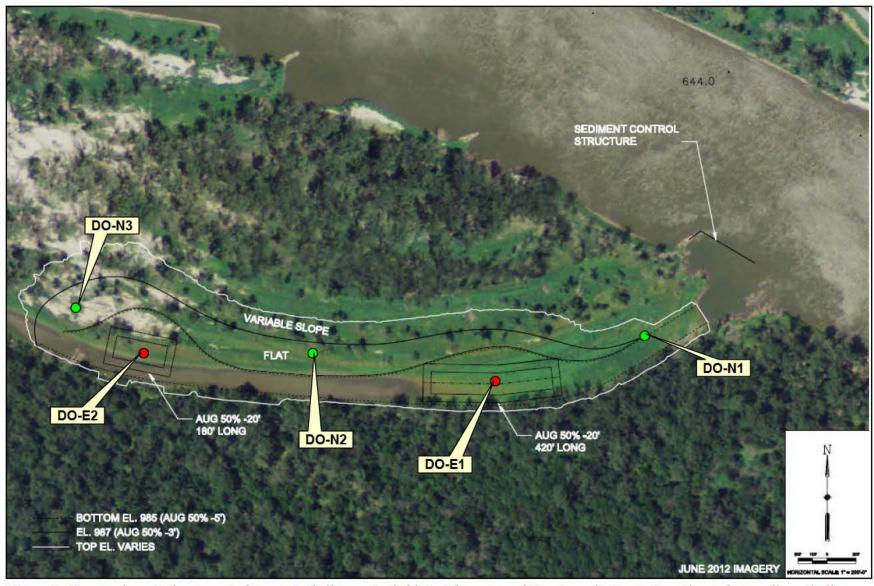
Proposed area to be excavated to create shallow-water habitat at the proposed Desoto project area. Locations where sediment/soil samples were collected are shown.
